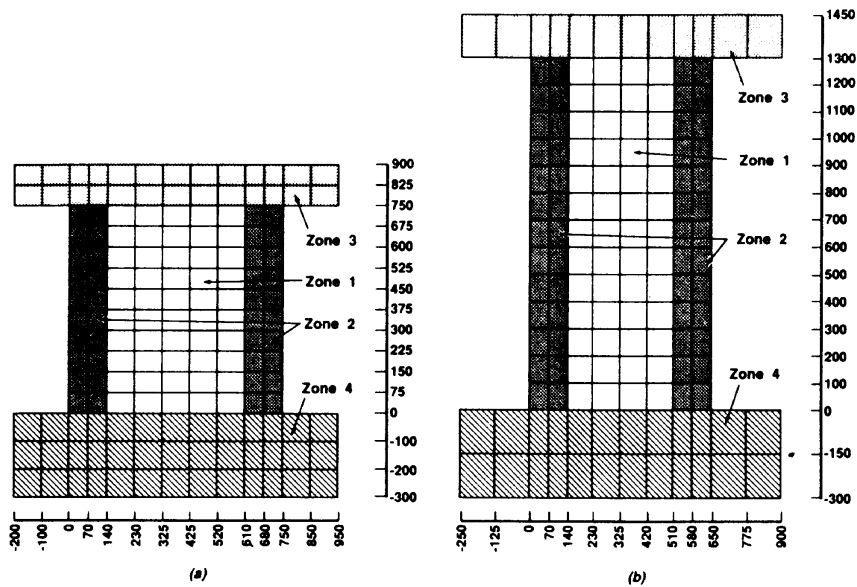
Finite Element Modeling of Walls (See Tables 3 and 4 for Concrete and Reinforcement Properties): (a) Type-I Walls; (b) Type-II Walls
